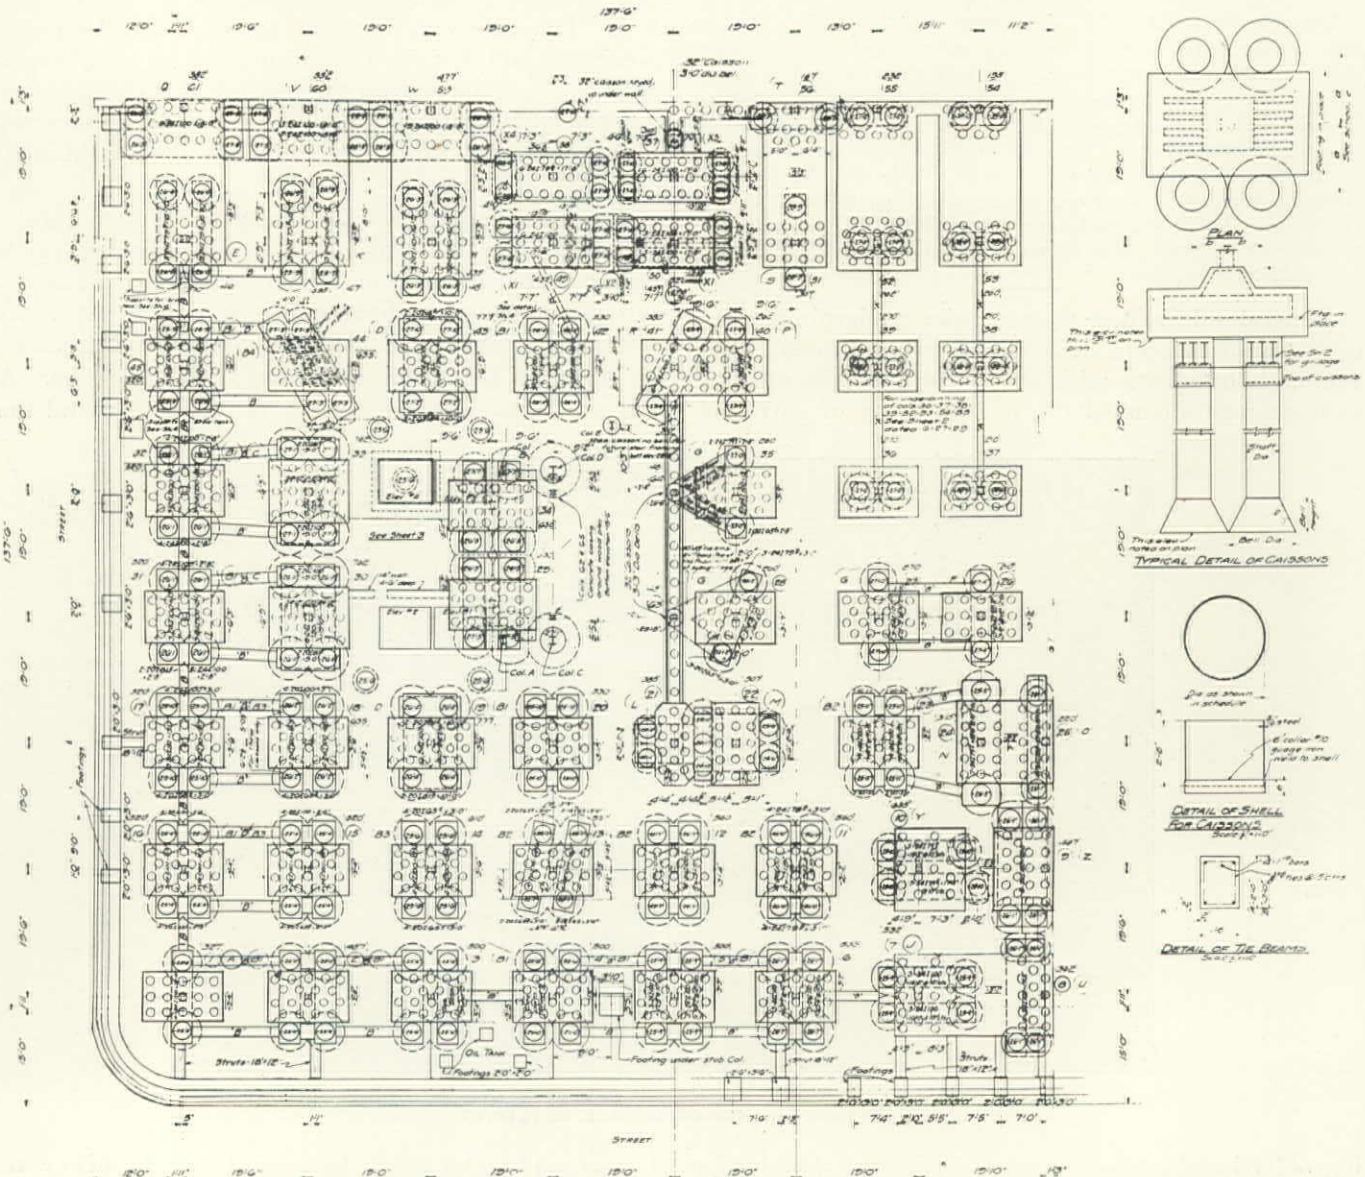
FOUNDATION PLAN OF 14-STORY OFFICE BUILDING IN SAN FRANCISCO, SHOWING ORIGINAL WOOD PILE FOOTINGS, AND NEW CAISSON UNDERPINNING
